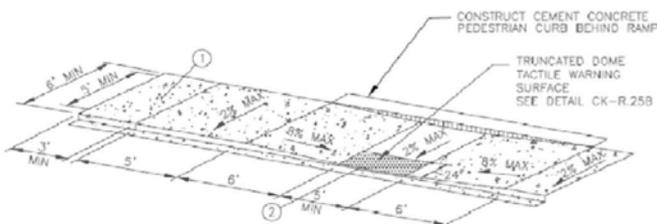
Sample drawing from pre-approved plans showing how to construct a mid block sidewalk ramp
